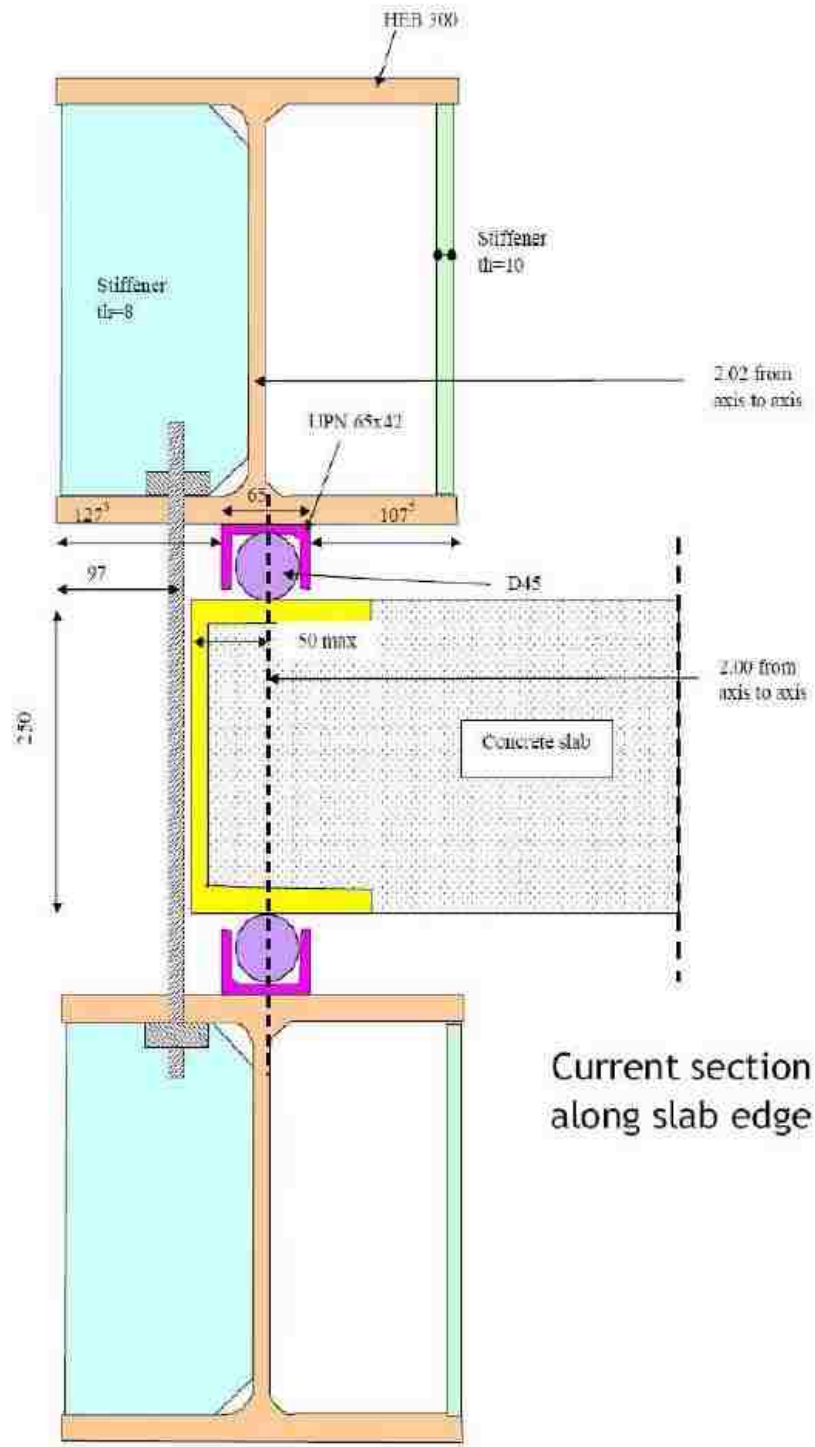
IRSN VTT Punching mounting fixture schematic
